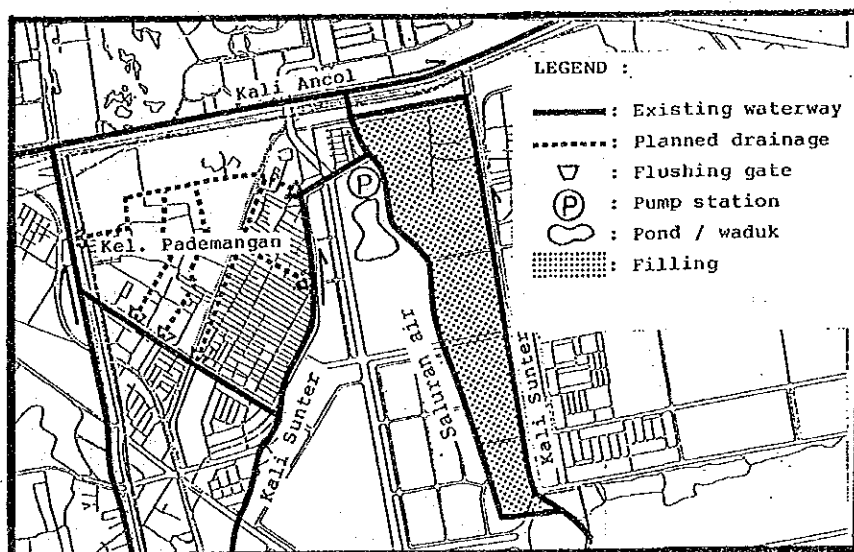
Conceptual plan of Flood Control and Drainage System
